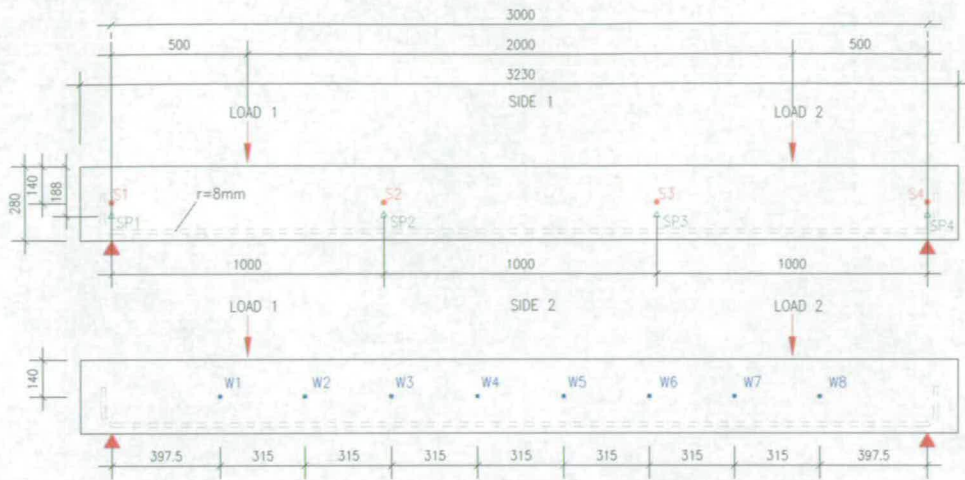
Design details, test configuration and sensor location (resonant: S1 to S4 - broadband WD type: W1 to W8 - SoundPrint: SP1 to SP4) of beam BF5.
